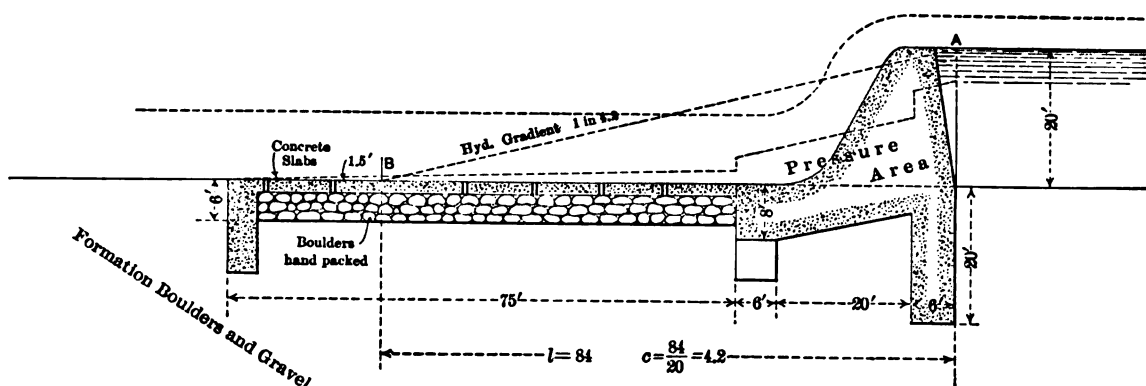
GRANITE REEF WEIR ON SAND AND GRAVEL FOUNDATION.
